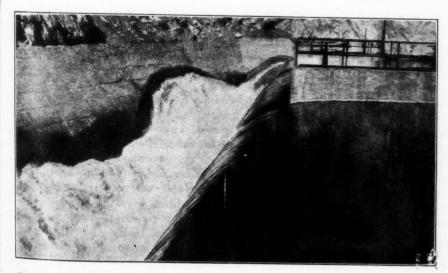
Arrowrock Spillway, June 12, 1923, Looking Up Strfam from Pier No. 4.
